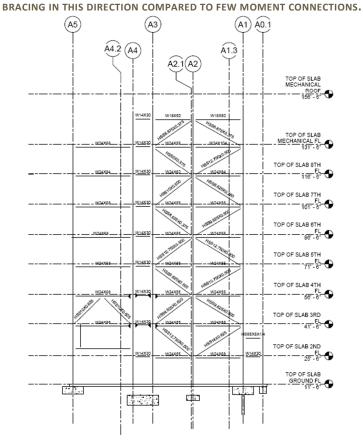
ABOVE IS AN ELEVATION OF THE FRAMING SYSTEM LOOKING IN THE NORTH/SOUTH DIRECTION. NOTICE ONLY MOMENT CONNECTIONS EXCEPT FOR THE CROSS BRACING ON THE BRIDGE. BELOW IS AN ELEVATION OF THE FRAMING SYSTEM LOOKING IN THE EAST/WEST DIRCTION. NOTICE THE MAJORITY OF CROSS
